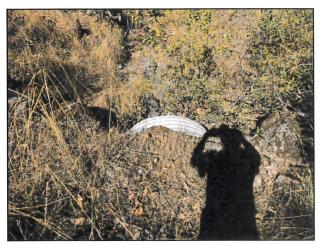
River Rd Looking @ 36" Culvert Out (Dual?)
